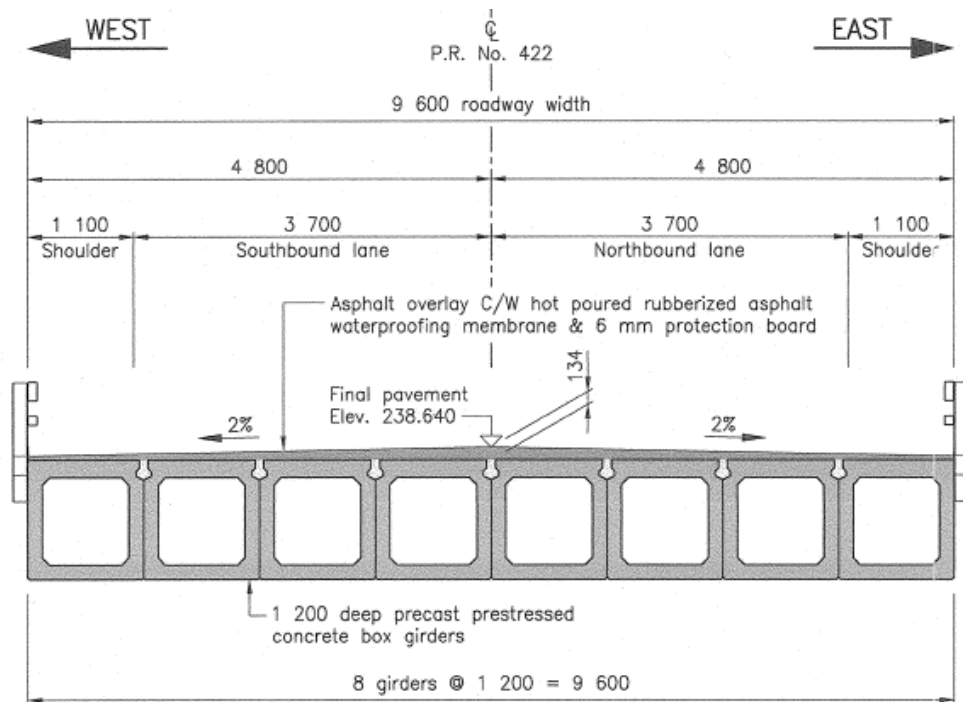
Cross Section of Prestressed Box Girder Span (WSP 2018)
